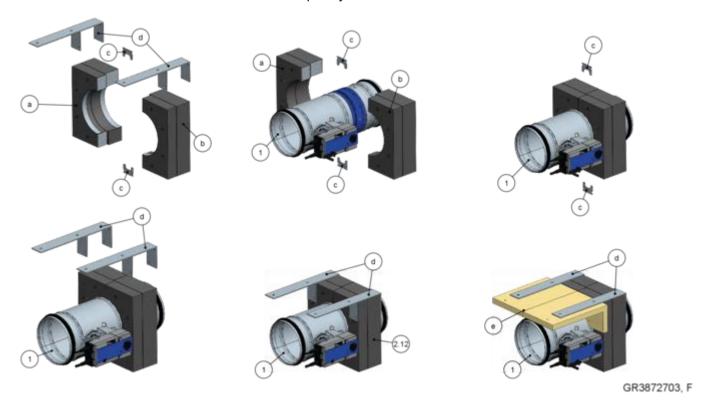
Scope of supply and installation of installation kit GL2 (steel bracket and cover to be provided by customer) for dry mortarless installation if there is no ceiling fitting on the rear side
